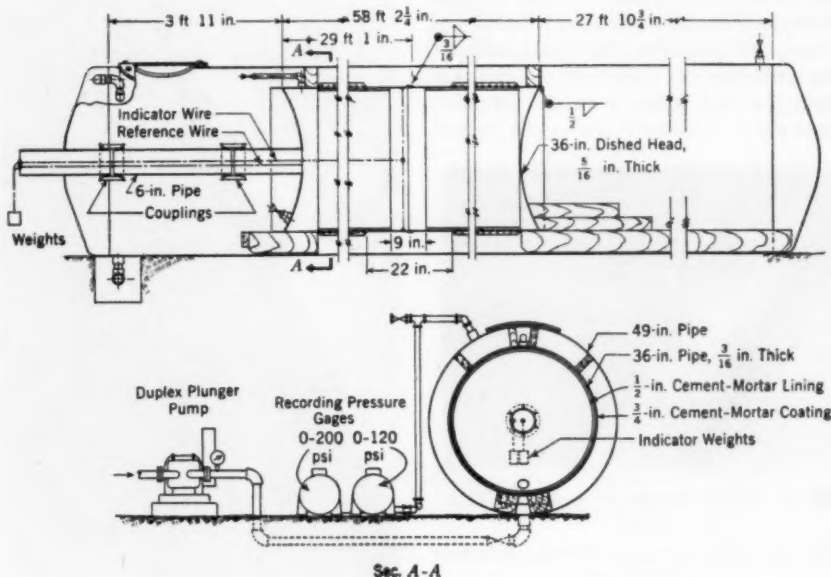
Arrangement of 36-in. Pipe Inside 49-in. Pipe
